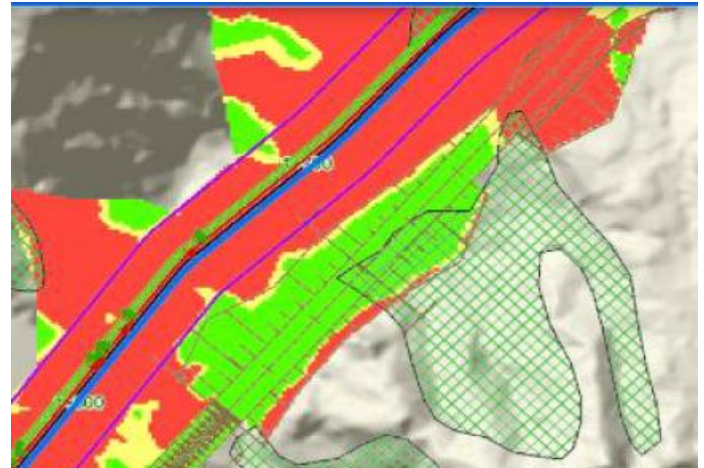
CONSTRUCTION GRADE PLAN IMPACT ON EXISTING GEOHAZARD (LANDSLIDE)
